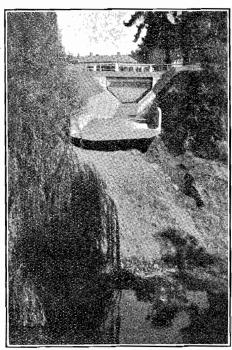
Outfall Structure, Kennedy's Gully Drain, Bacchus Marsh.
